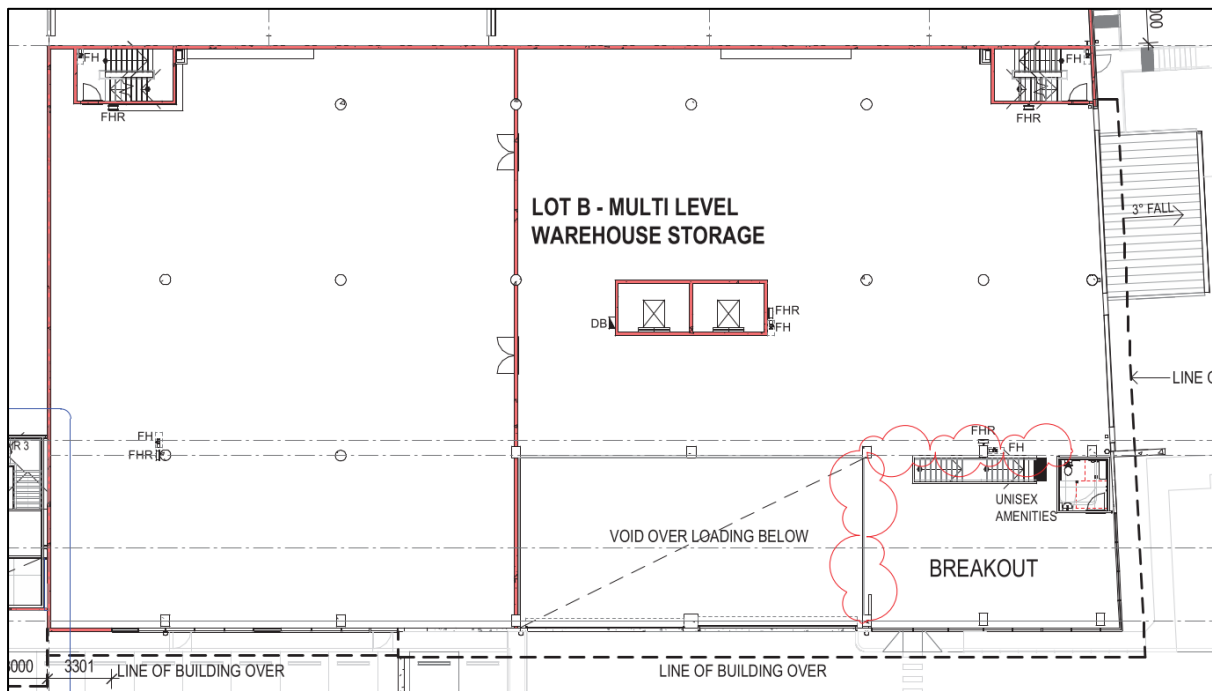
Extract of the approved first floor – Lot B Building 1, in CDC-20083.
